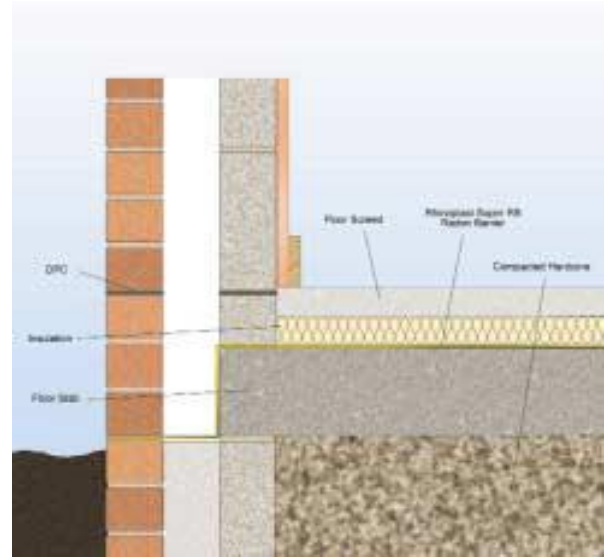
Detail of radon barrier over the floor slab and under insulation and screed
